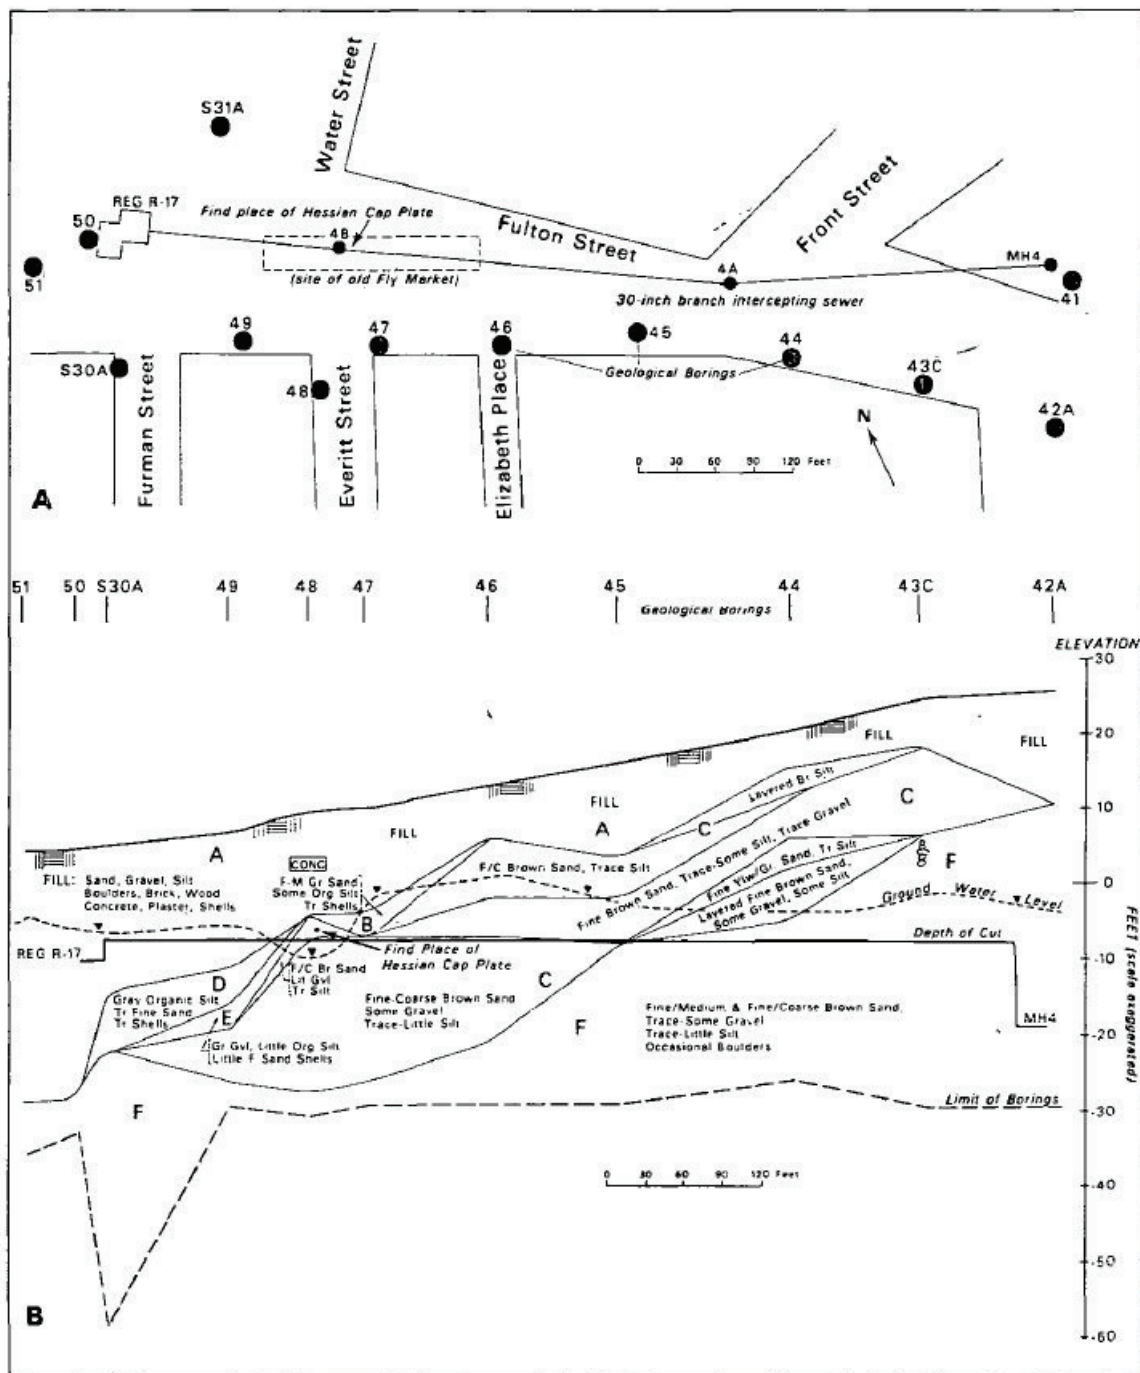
Plan (A) and cross-section (B) of excavated trench along Old Fulton Street (Solecki 1981, Figure 7 on page 299).
